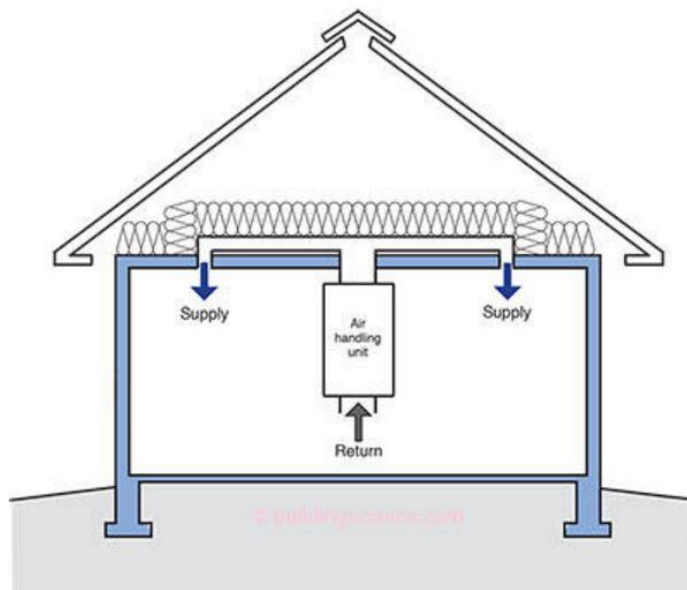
"Buried Ductwork" Concept - Ductwork located under attic thermal insulation in traditional vented attic.
